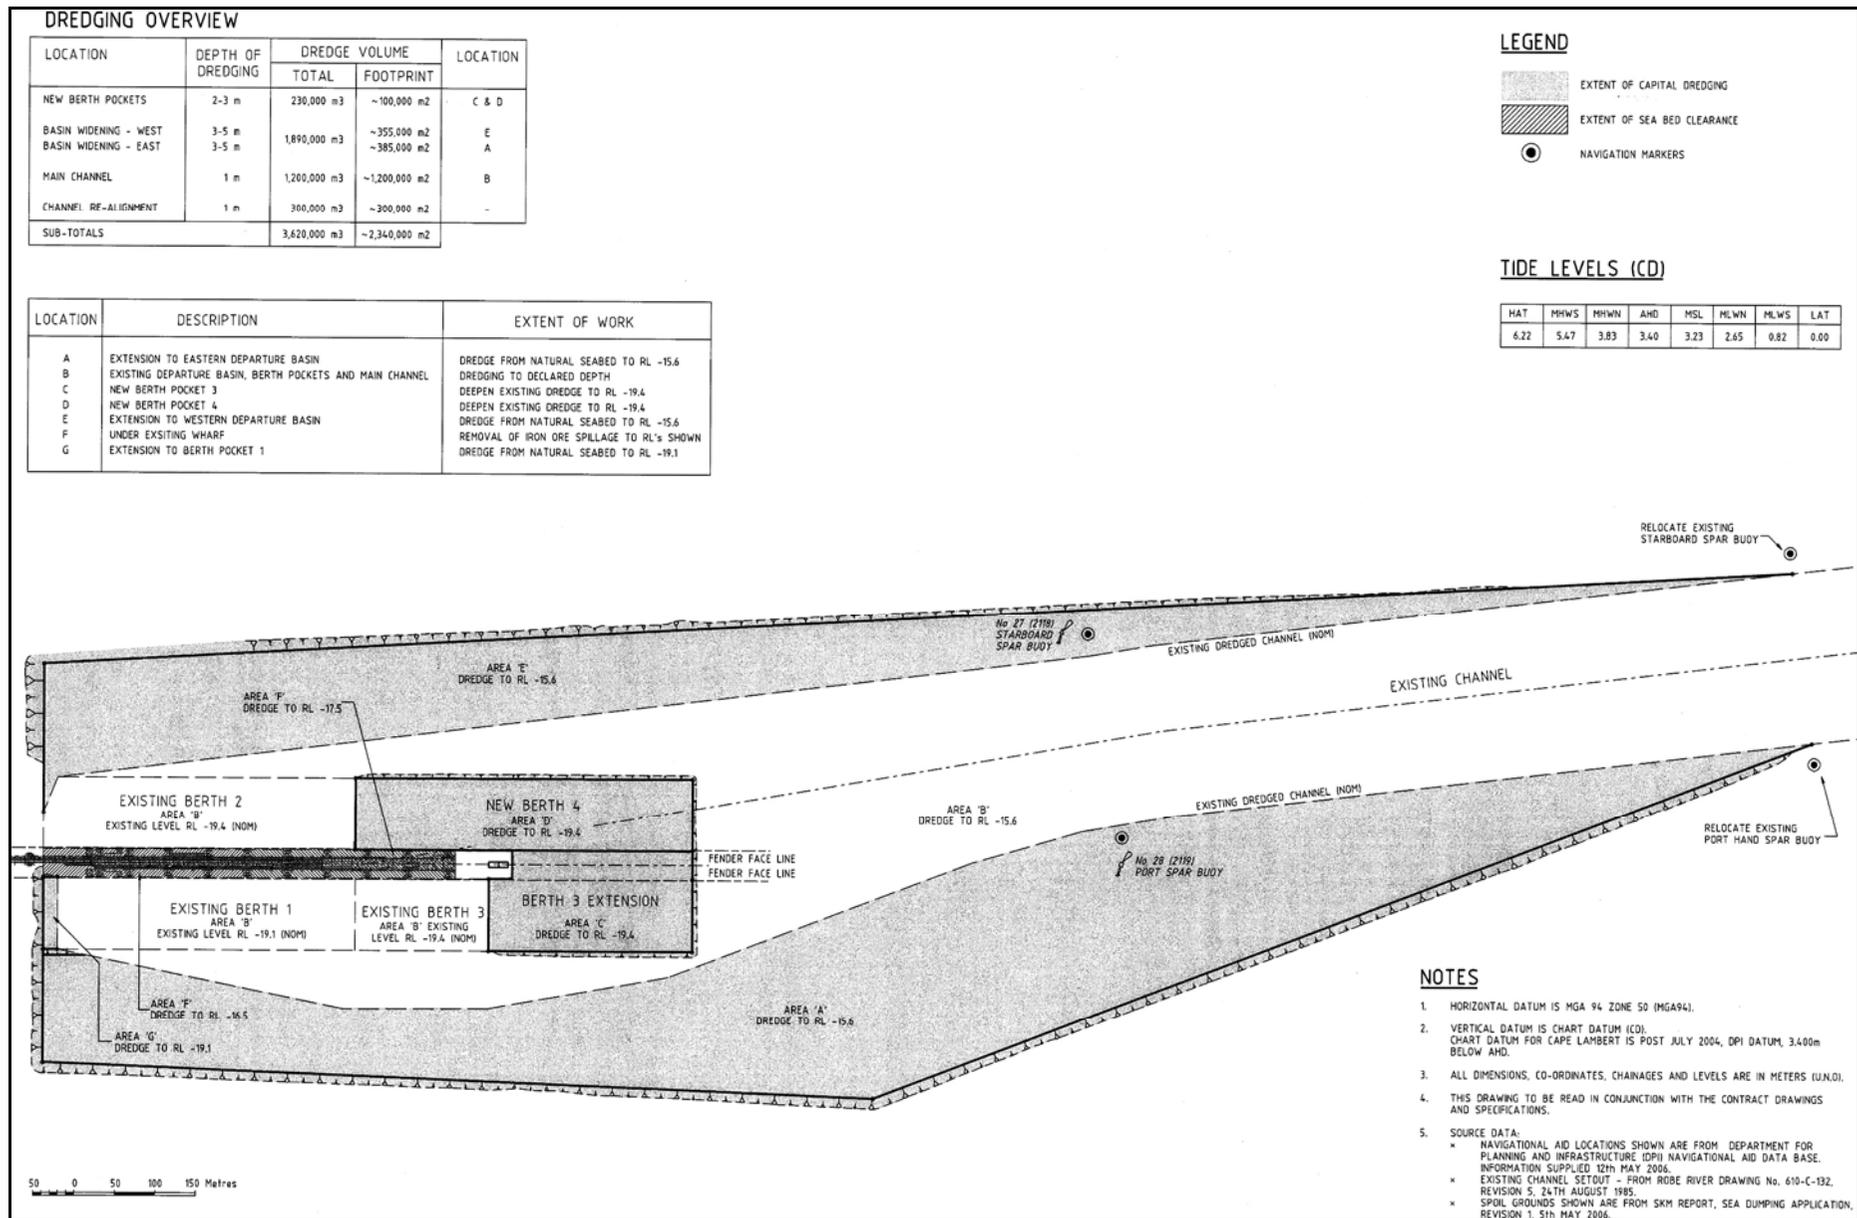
Proposed Berth Pocket and Departure Basin Dredging Overview.
